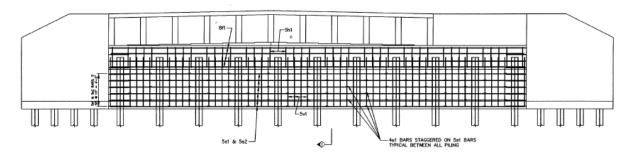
Elevation View of composite timber bridge abutment, page U.01 in Appendix A
